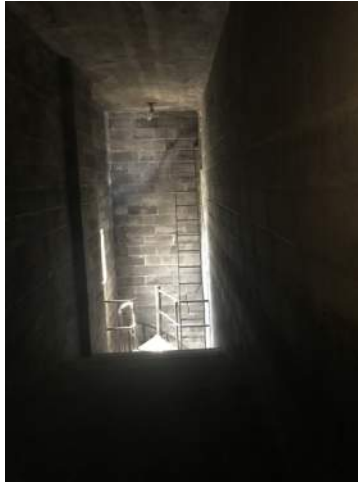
Interior South West Stairwell wall cracks
